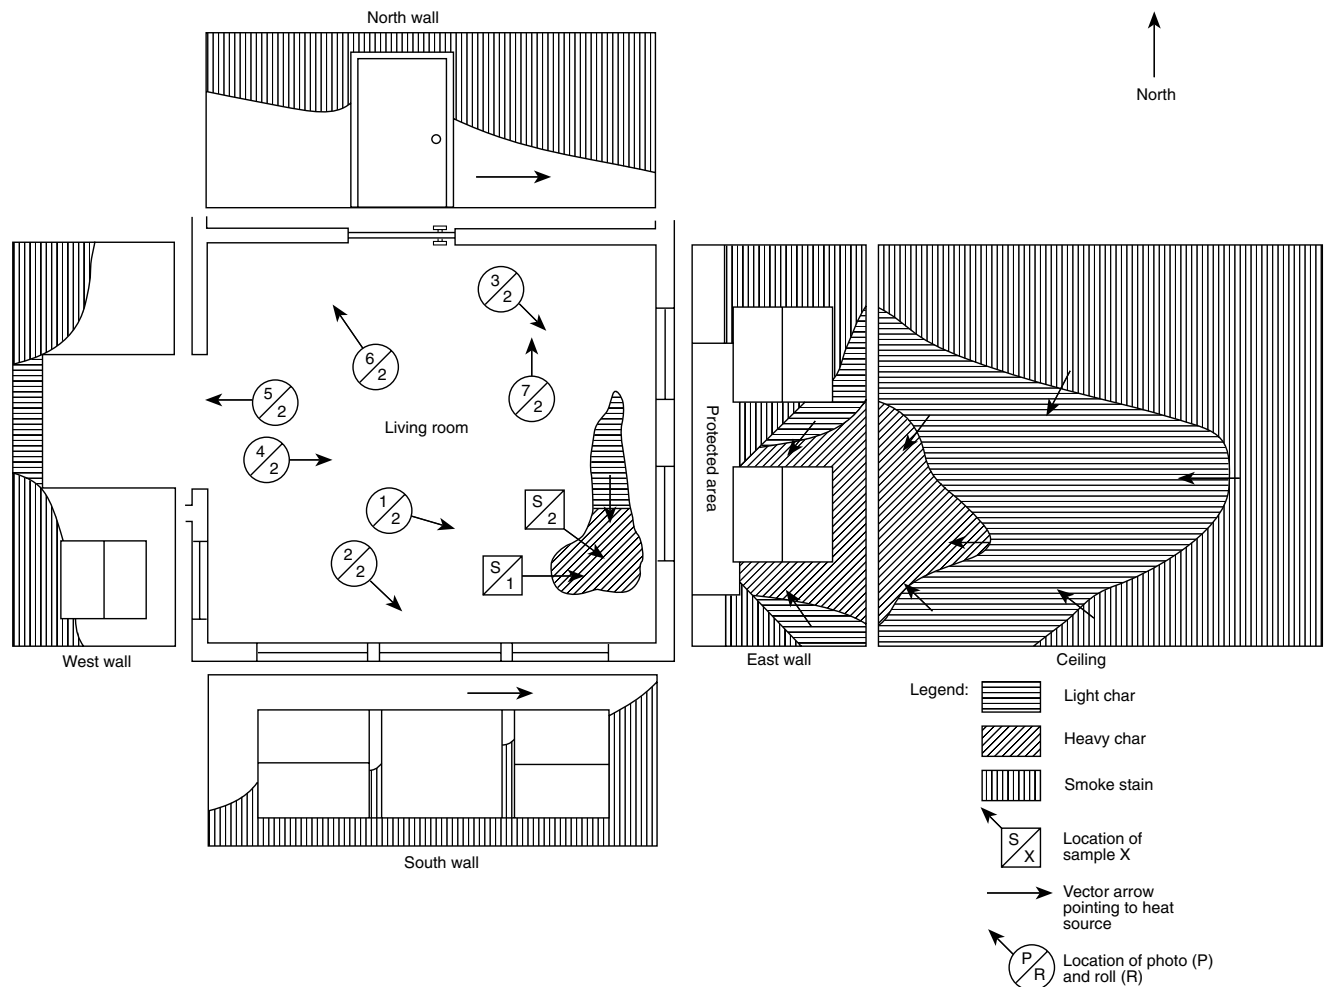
(d) Exploded room diagram showing damage patterns, sample locations, and photo locations.
